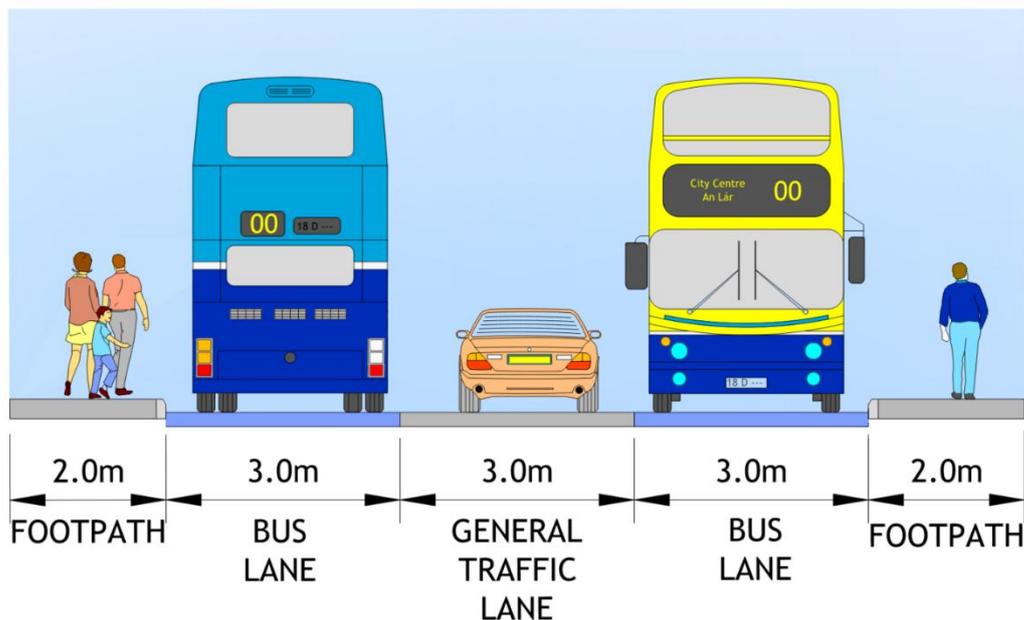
Cross-Section B-B (Relevant to RF9)
